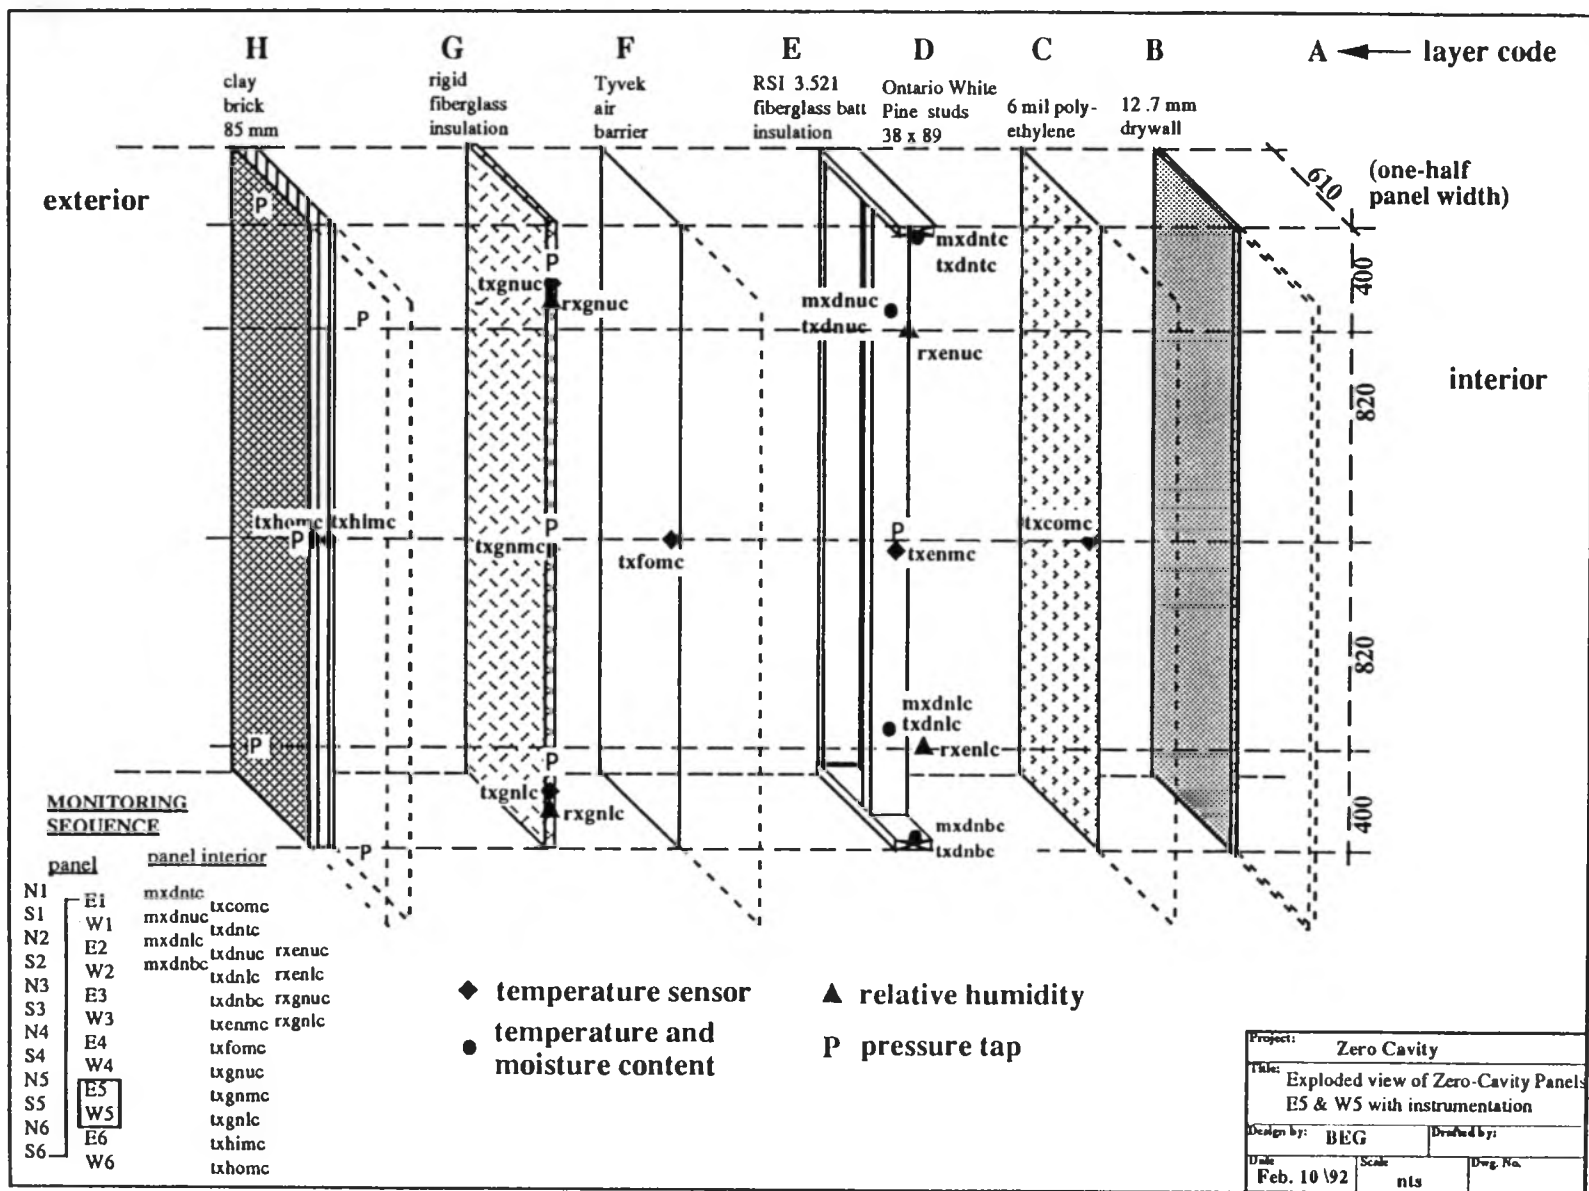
Exploded View of Zero-Cavity Panel Construction
